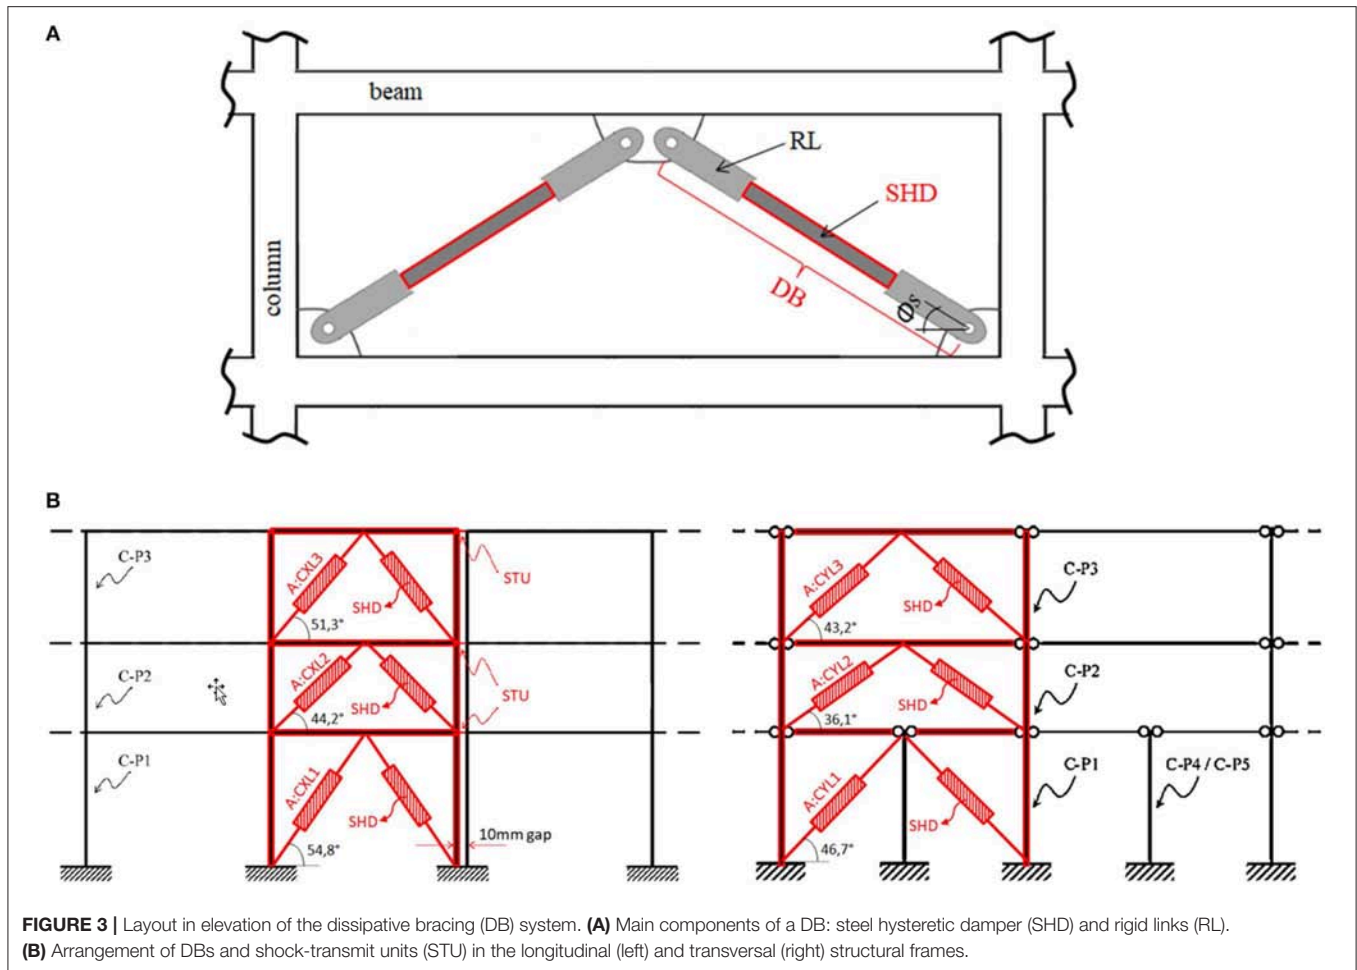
| Layout in elevation of the dissipative bracing (DB) system. (A) Main components of a DB: steel hysteretic damper (SHD) and rigid links (RL). (B) Arrangement of DBs and shock-transmit units (STU) in the longitudinal (left) and transversal (right) structural frames.
